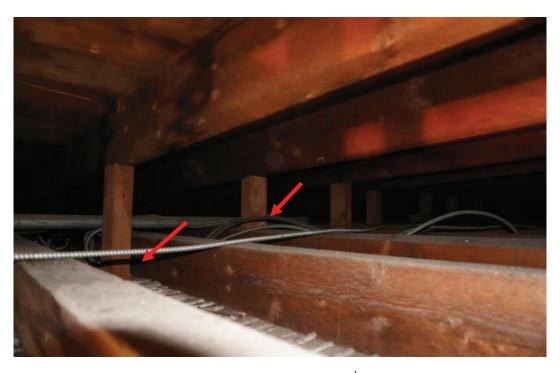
View facing northeast in roof void between 2nd floor ceiling joists and roof joists in the addition. Roof joists do not align with ceiling joists and are being supported at midspan with blocking that is resting right onto plaster ceiling (Probe #9).
